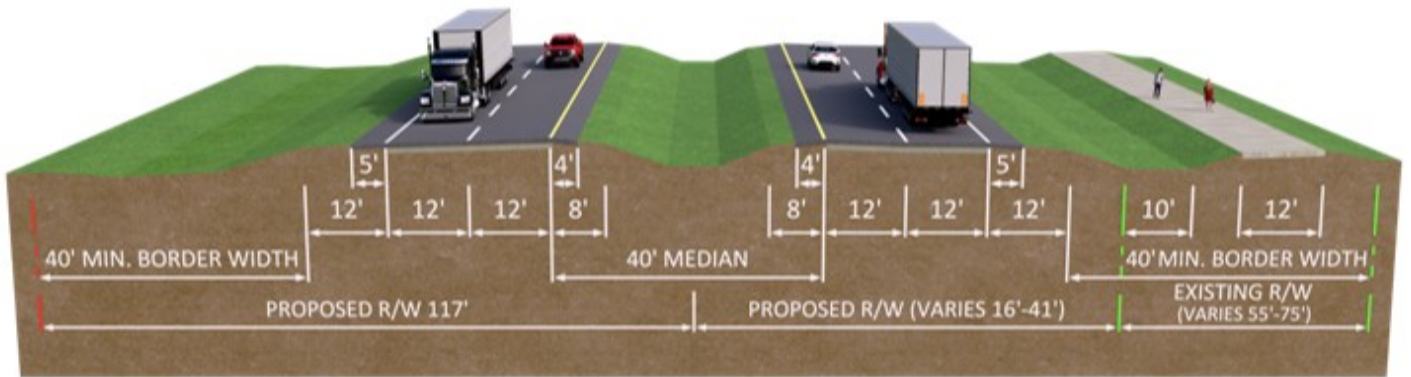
Preferred Alternative Roadway Typical Section: Lonesome Island Road to Harney Pond Canal C-41; also Indian Prairie Canal C-40 to Approximately 1500 feet East of Canal C-40
